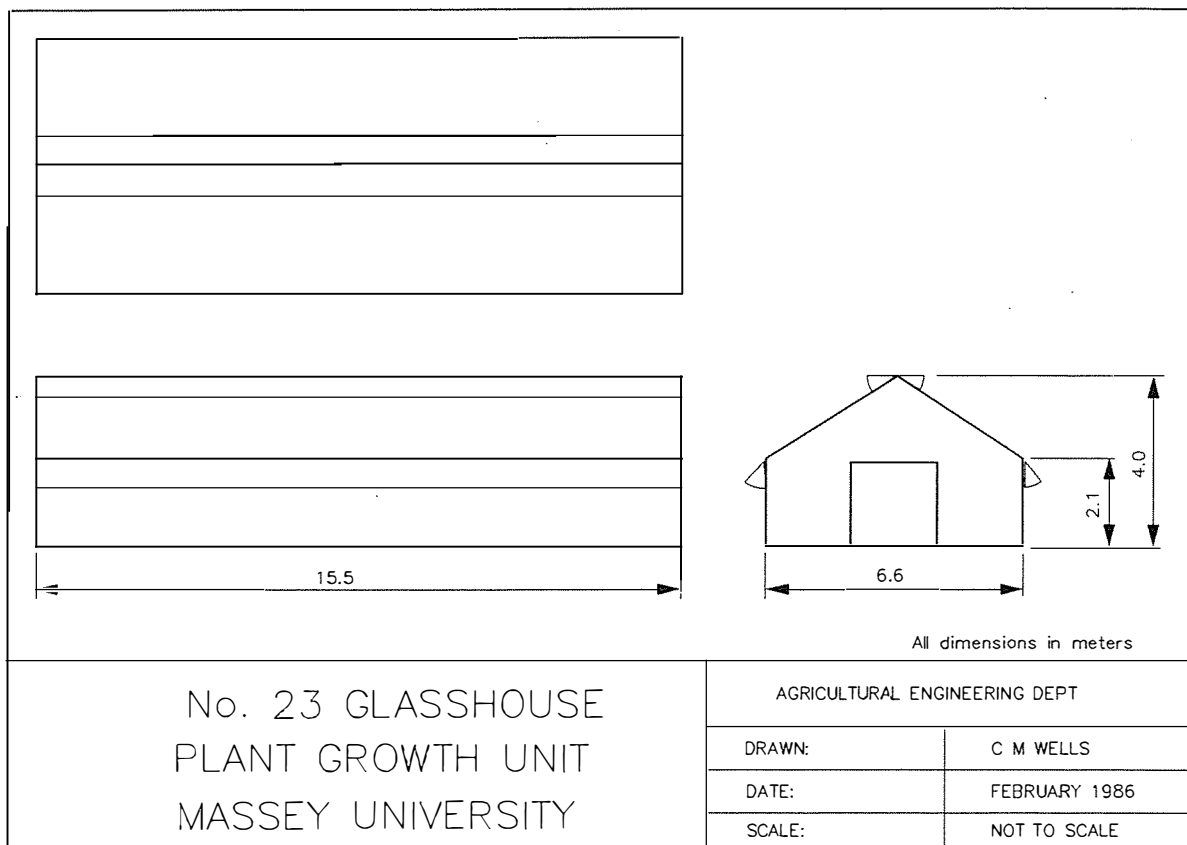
Plan of No. 23 Greenhouse, Plant Growth Unit
